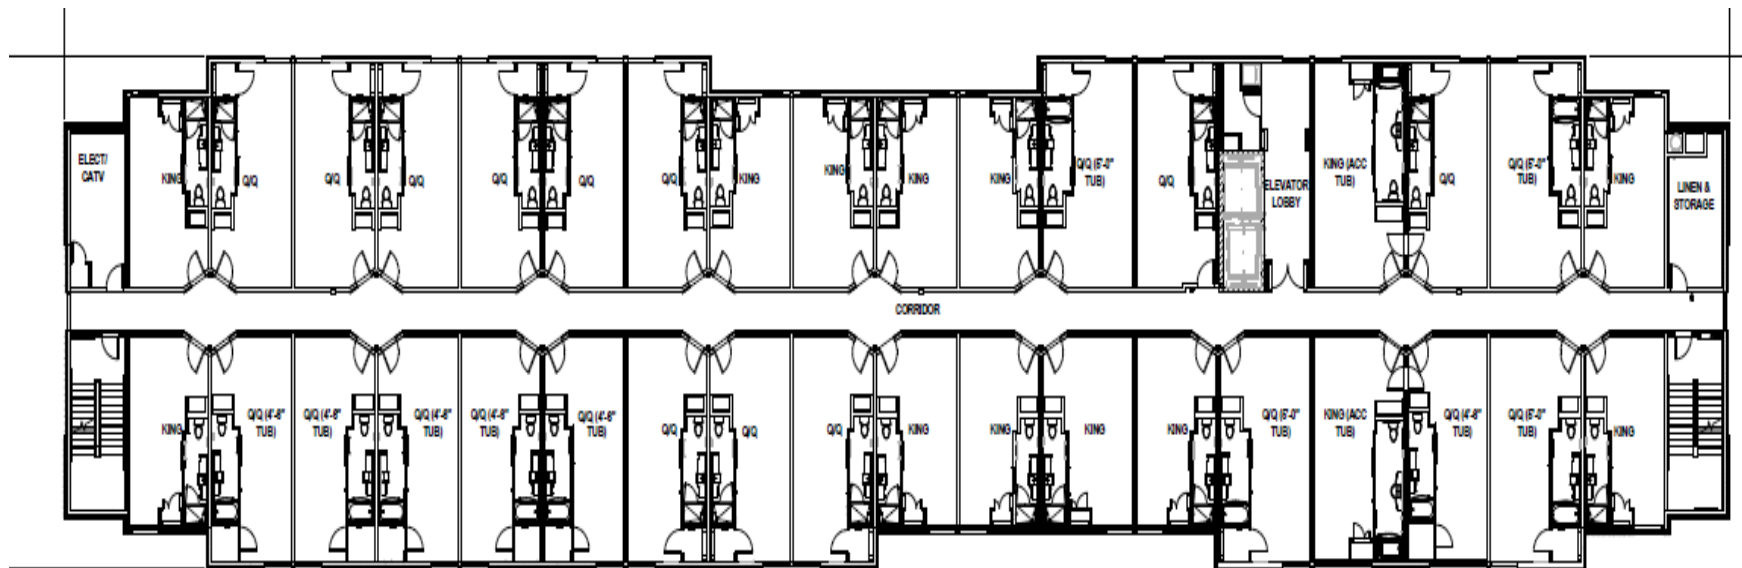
Exhibit C: Floor Plan-1<sup>st</sup> Floor
